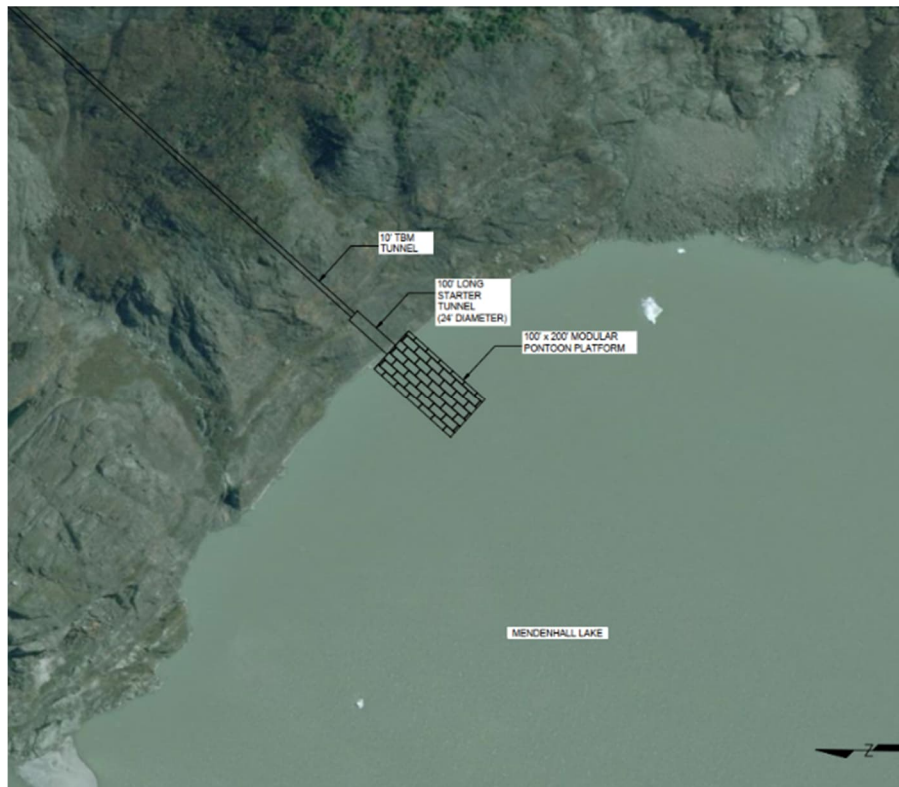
Tunnel Portal/Outfall Preliminary Location
